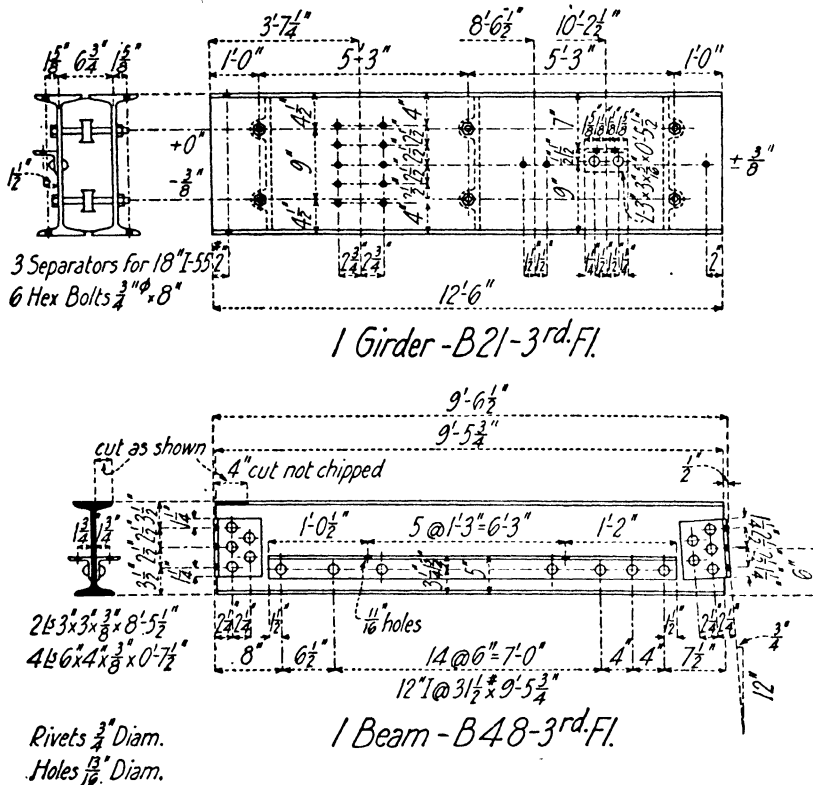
STANDARD DETAILS FOR ROLLED BEAMS.
